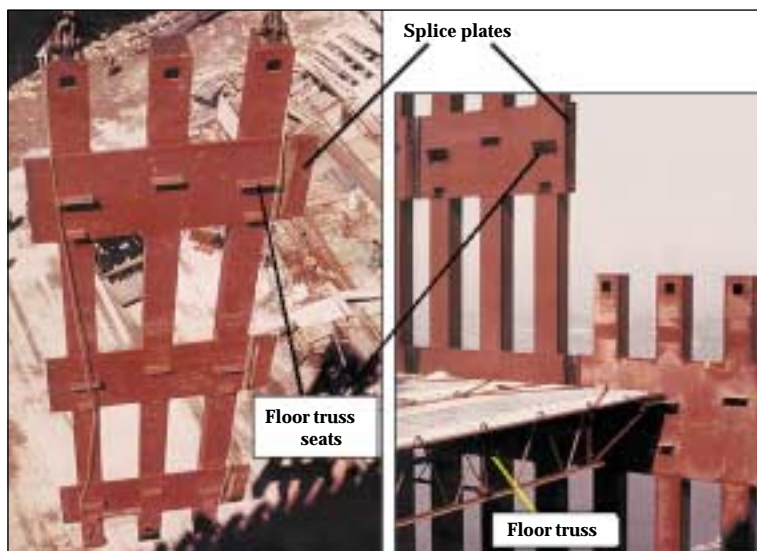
A three-column perimeter panel being lifted into place (left). Arrangement of perimeter panels and floor trusses connecting the perimeter columns and the tower core structure (right). Source unknown.
